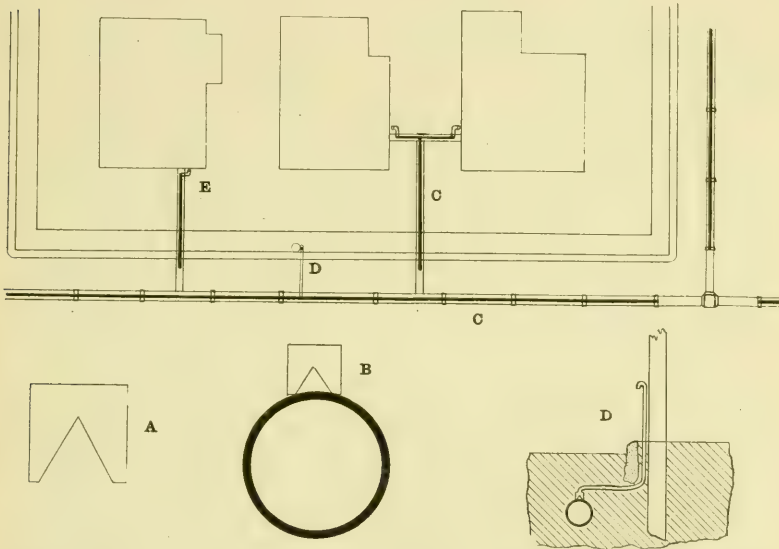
Protective arrangement against injury resulting from leakage of illuminating gas. A, cross section of protective conductor; B, adjustment of same to pipe; C, black lines showing method of arrangement of protective device on street and house service; D and E, vents for leakage.
